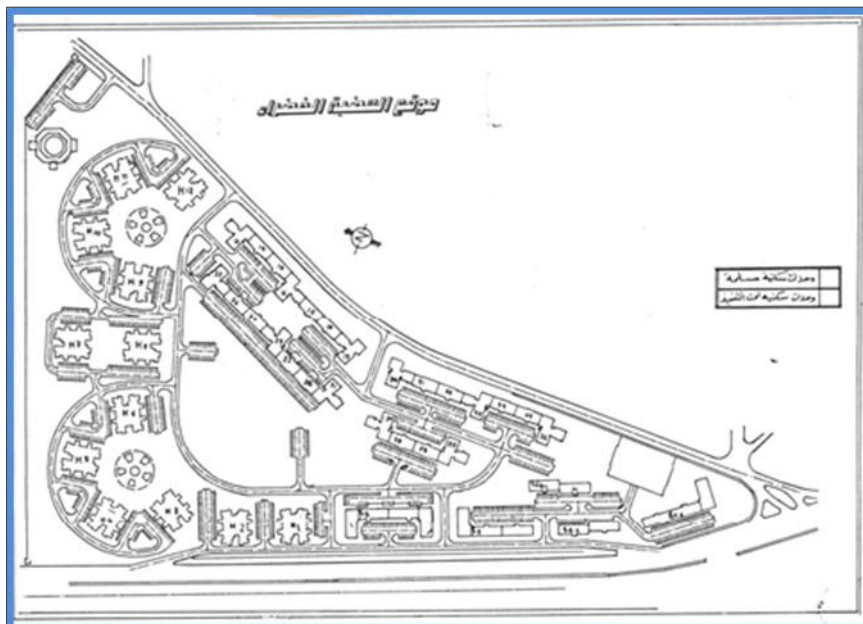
Layout Site Plan Al Hadba Khdra Housing Project (Source: Housing & Infrastructure Board, CMHP 2870 - 2018)
